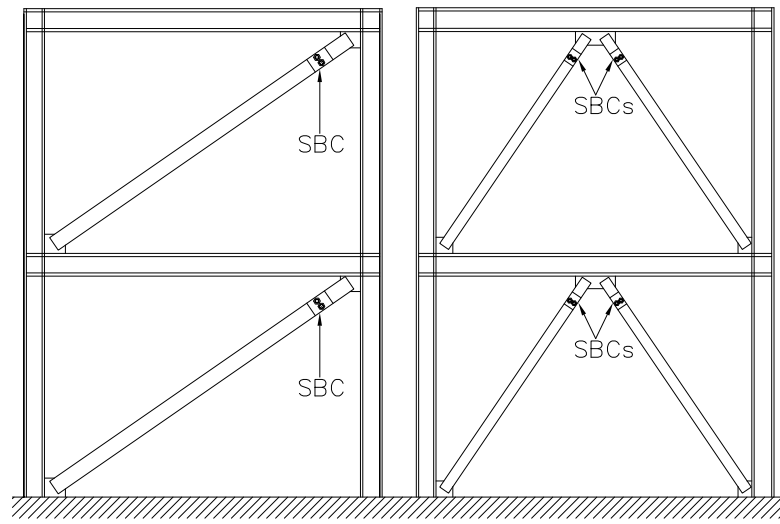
Diagonal and K-bracing systems (adapted from Butterworth, 2000)
